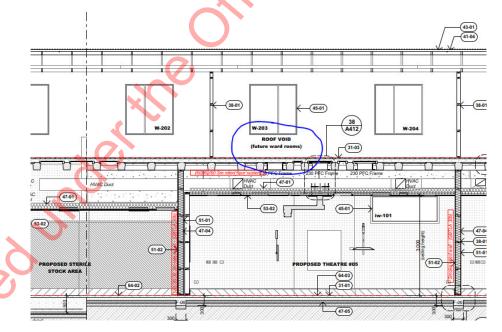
Future War rooms - Extracted from the architectural plan A303
